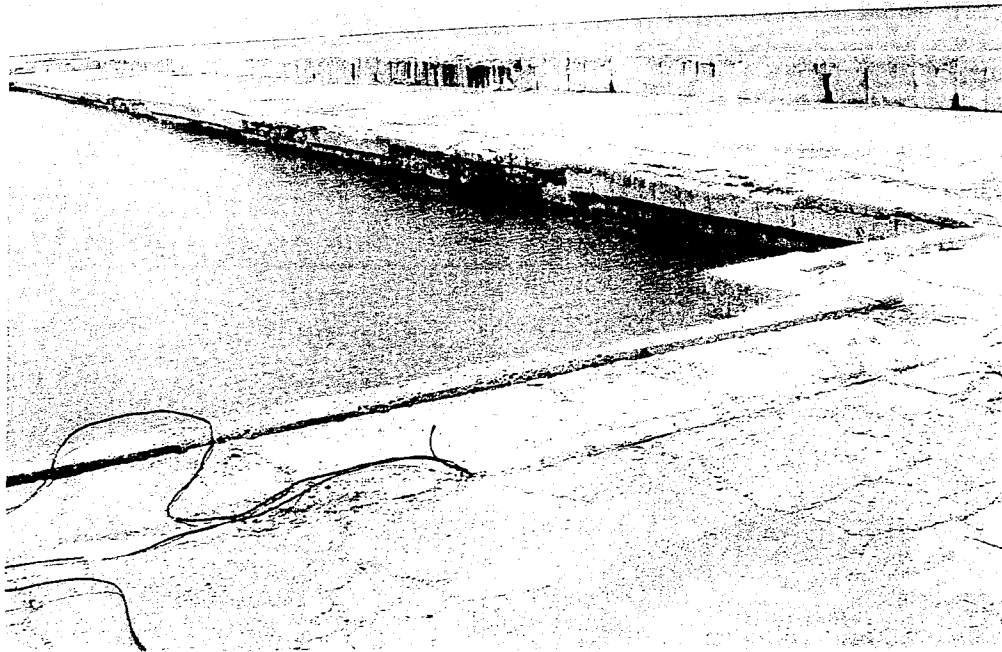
Pool Deck Deterioration with Exposed Wiring
